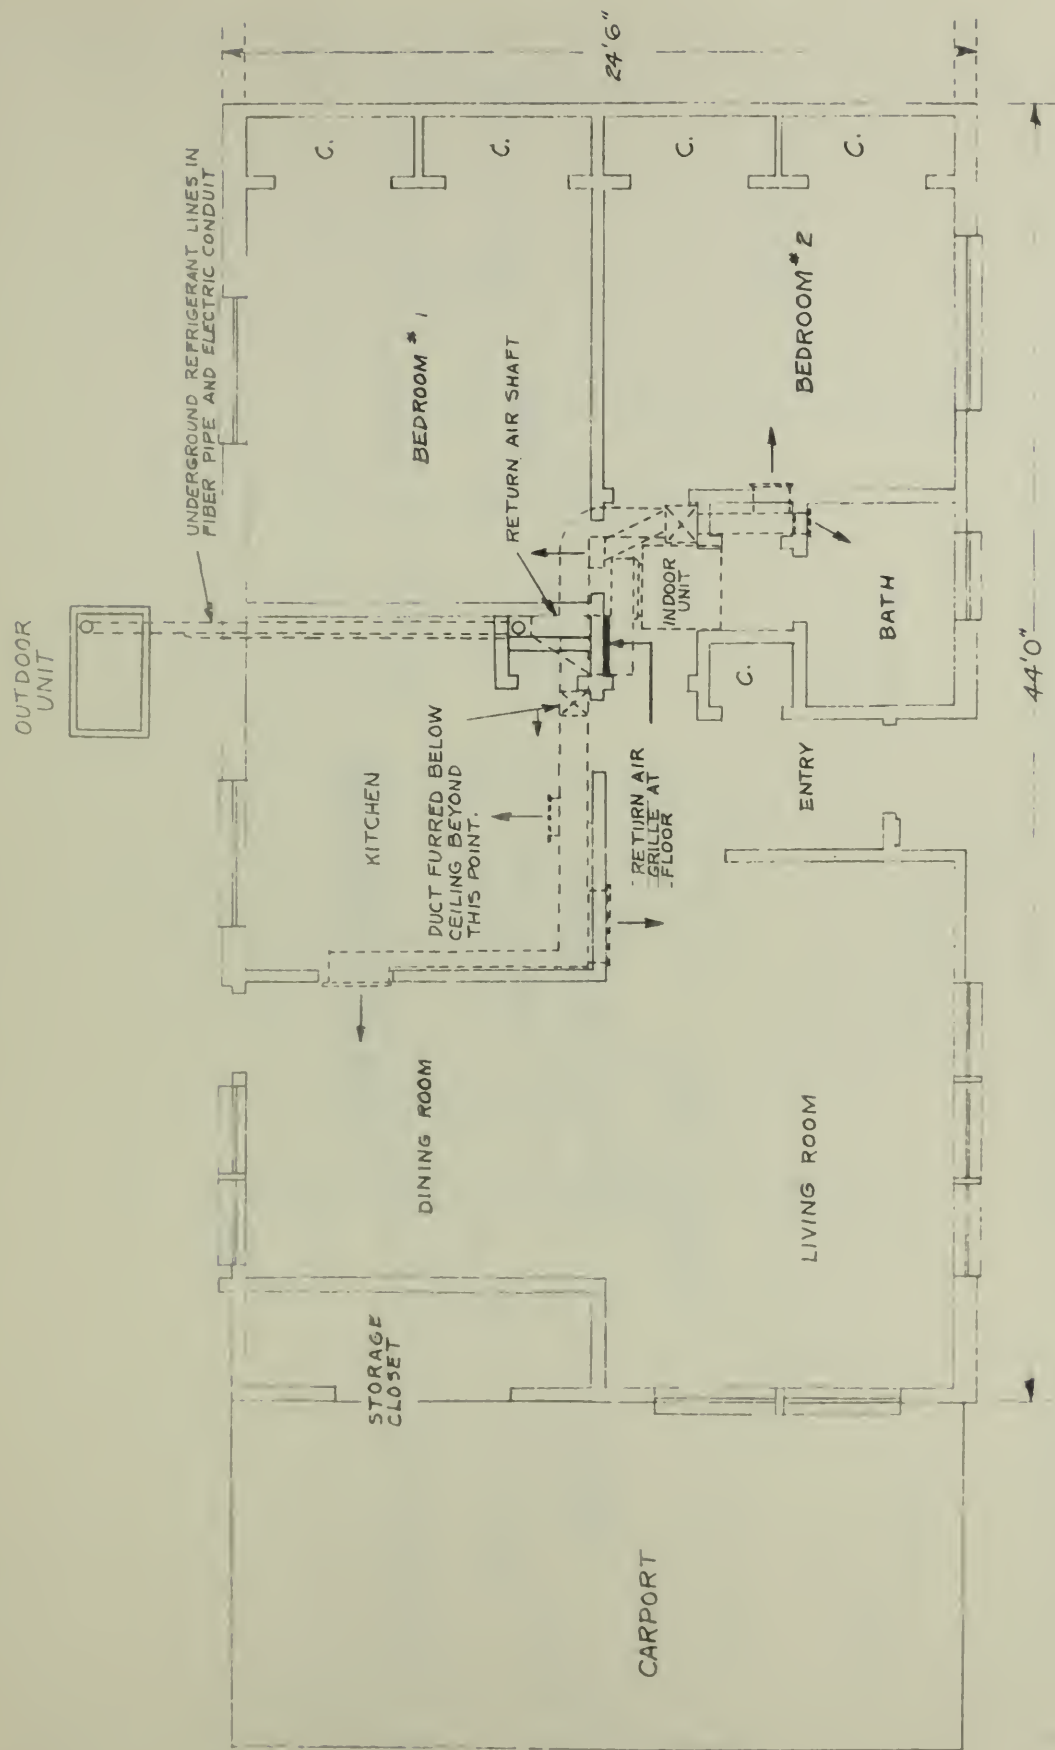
Plan View of Type A House, Seymour Johnson Air Force Base
